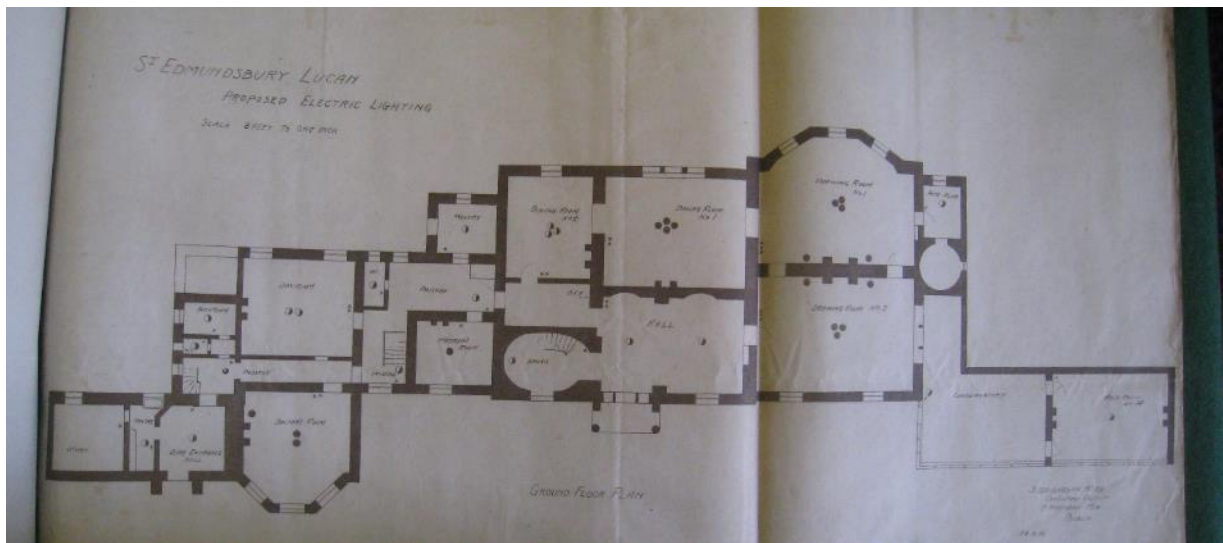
1906 Proposed electric lighting, ground floor plan. A conservatory and bedroom which are rectangular in layout are located to the west wing. Source: 1906 Proposed electric lighting S. Geoghegan.
